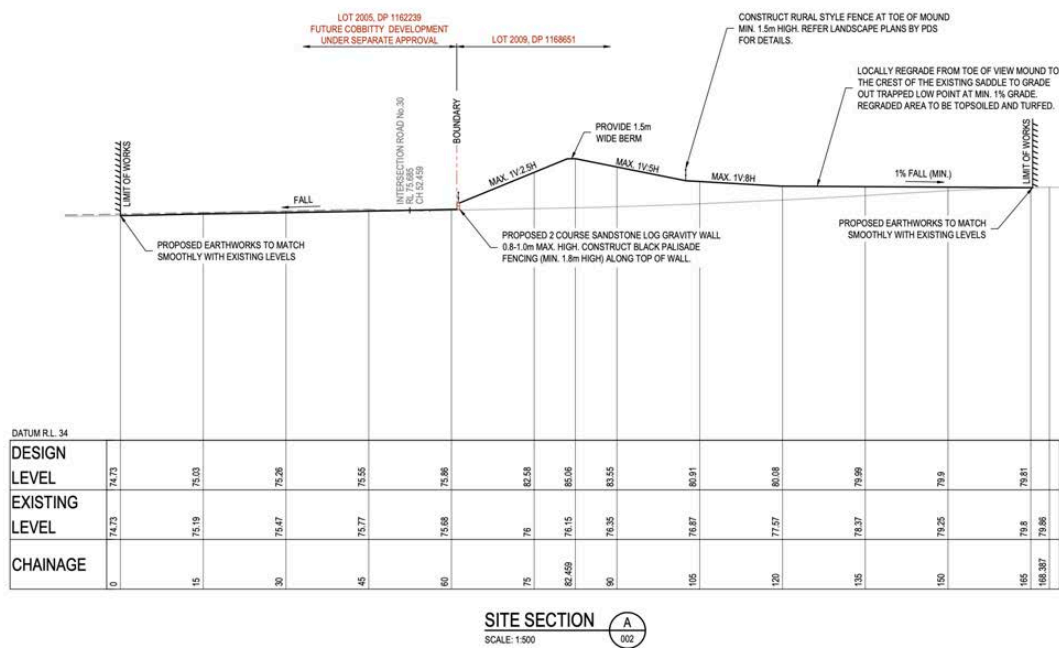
Site Section A (Plan 003, Site regrading Sections 01 of 02)
